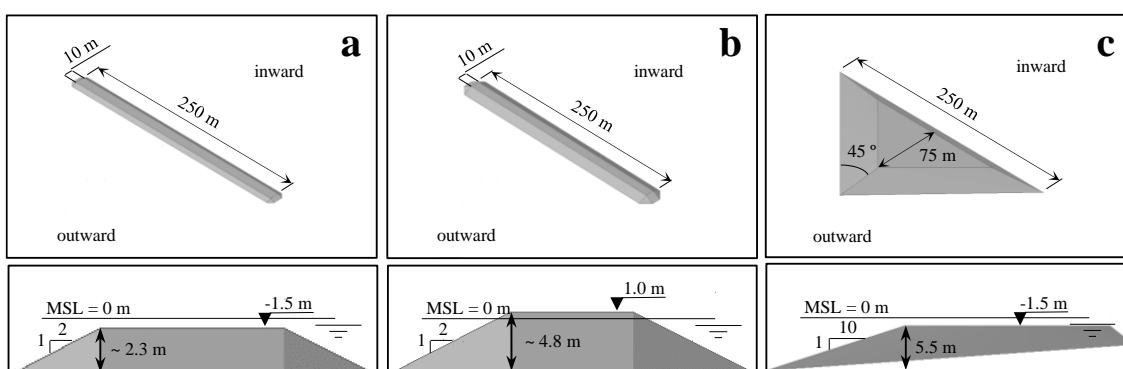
Geometrical shapes considered in the modelling Phase I (upper panel: plan view; lower panel: cross-section): a) submerged detached breakwater; b) emerged detached breakwater; and c) multifunctional artificial reefs (MFAR).
